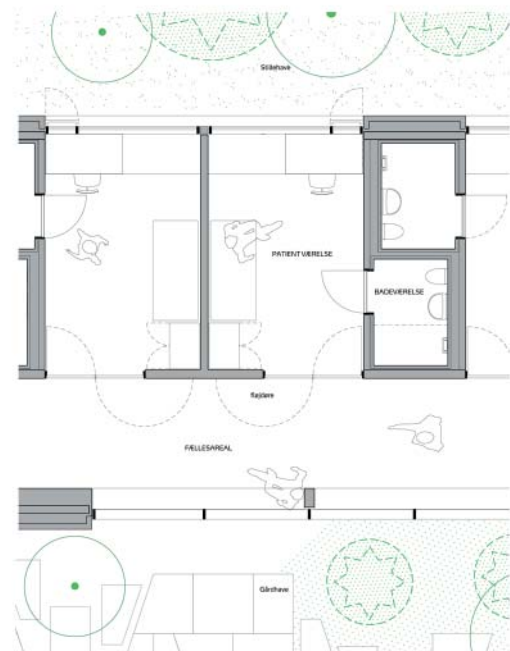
Floor plan for patient rooms (Karlsson Arkitekter)
